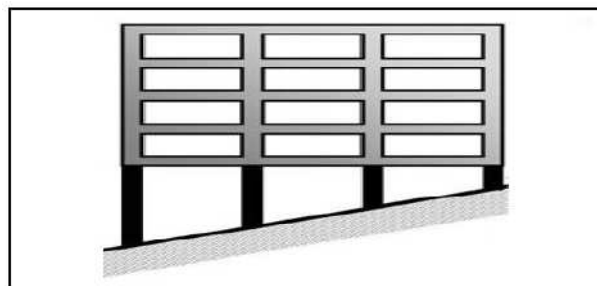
Ground floor on sloping ground (CVR Murty)
